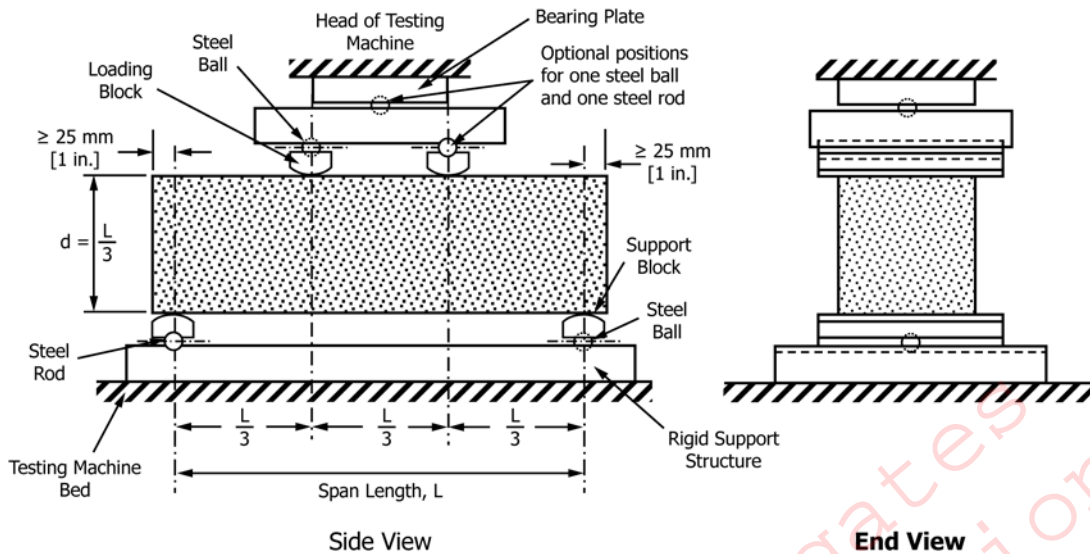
Schematic of Flexural Testing Apparatus for Third-Point Loading Method
